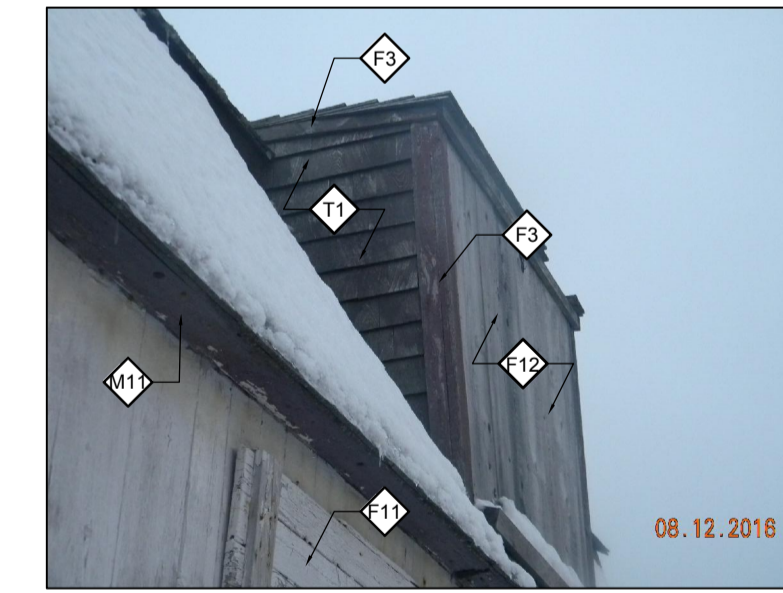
DETERIORATED SOFFIT BOARD TO REPLACE AND EXTERIOR SURFACE OF THE WINDOW DORMER
